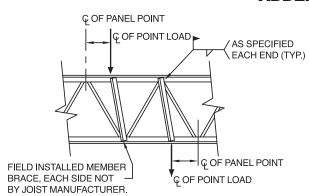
TYPICAL JOIST REINFORCEMENT AT CONCENTRATED LOADS
